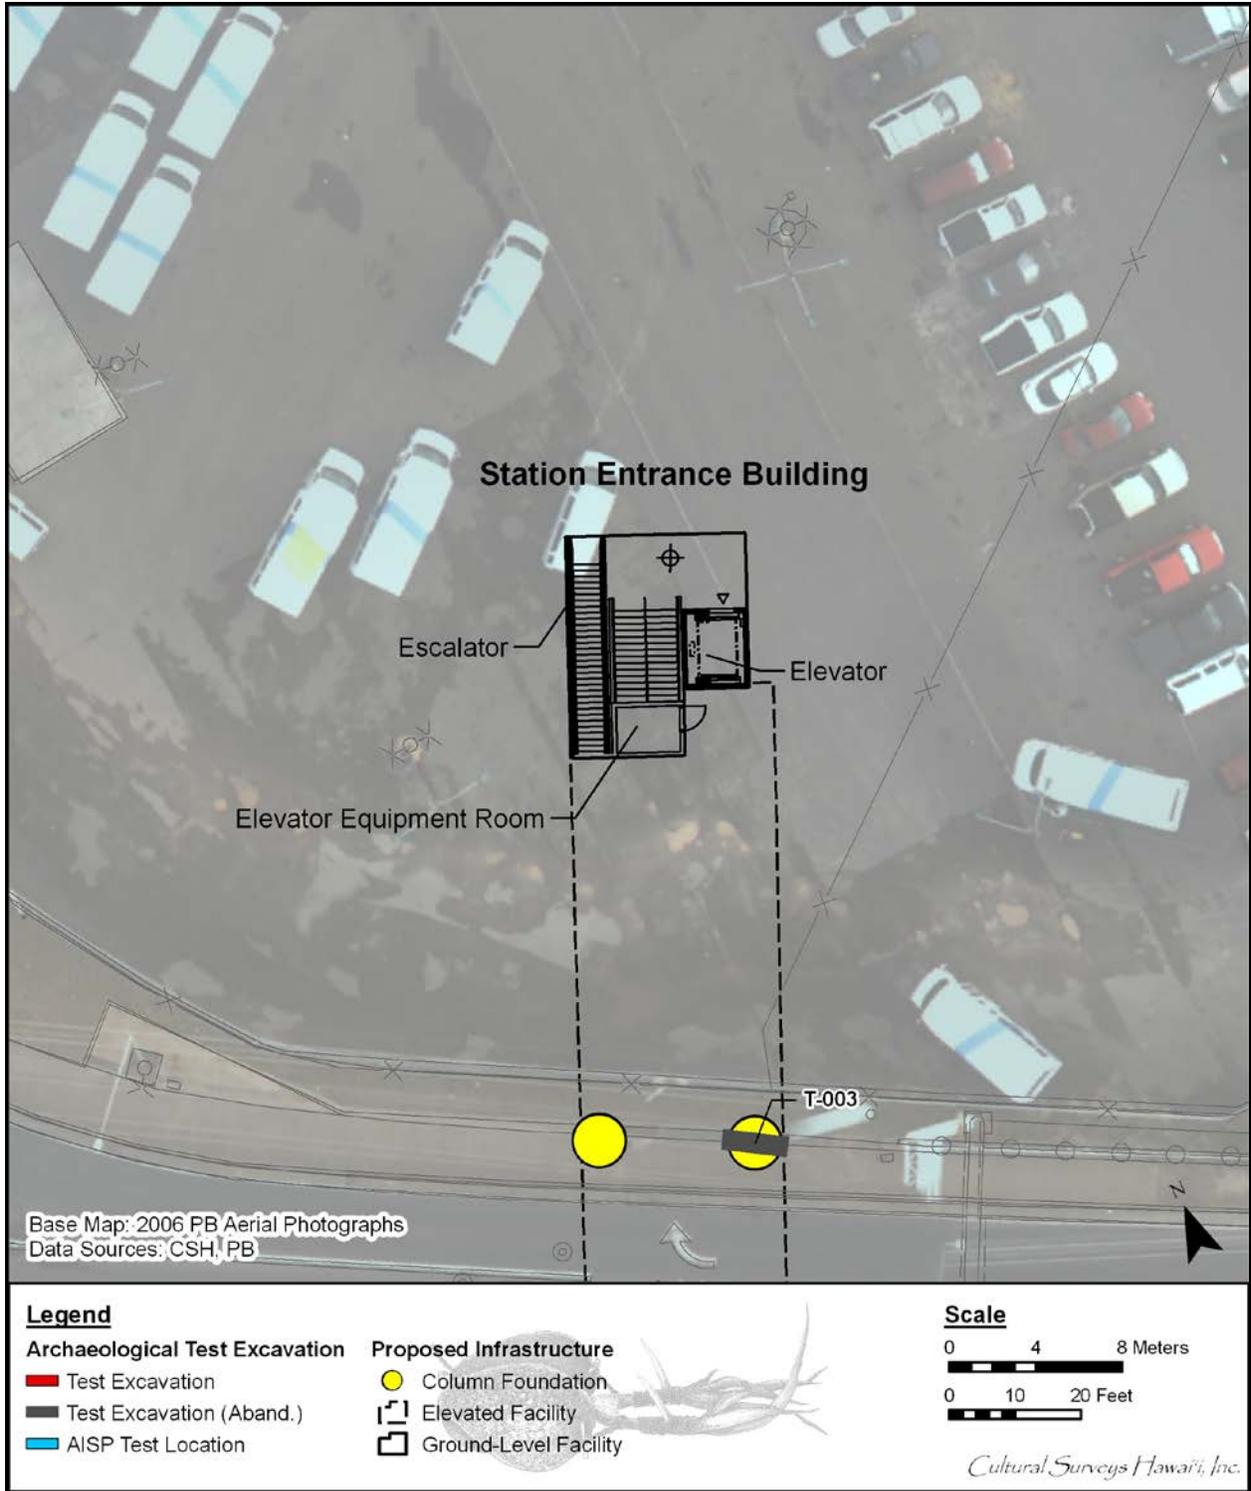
Middle Street Transit Center Station, detail of (*mauka*) Station Entrance Building (no test trenches at *mauka* Station Entrance Building due to prior soil remediation work); also note T-003, a test excavation at a column foundation that was abandoned
